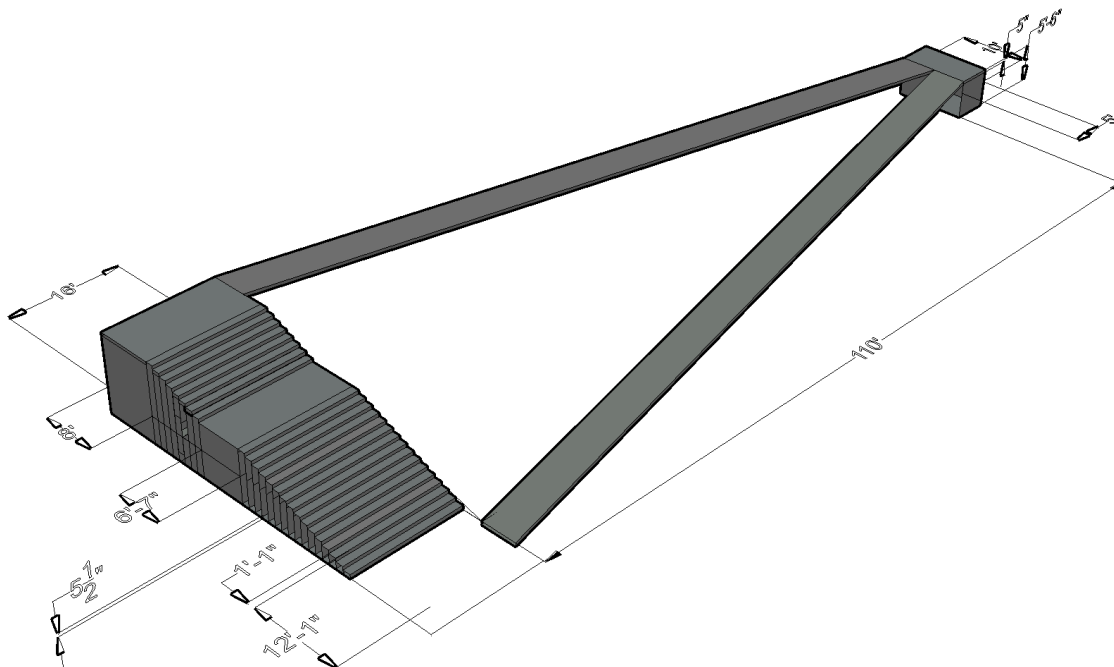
3D Bloomfield Sidewalk AutoCAD
